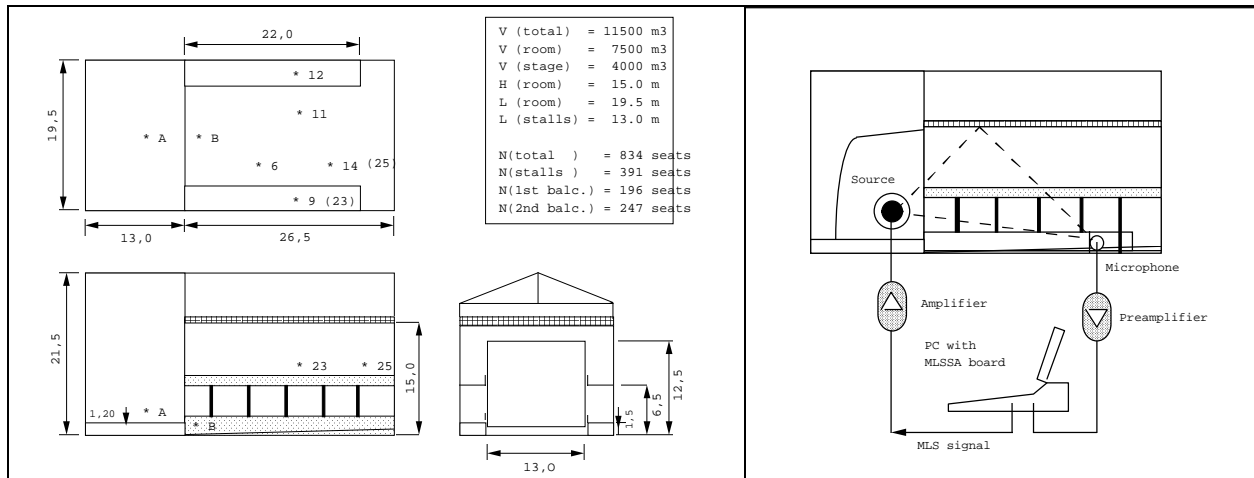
Plant and sections of the room (left) and measurement setup (right).
